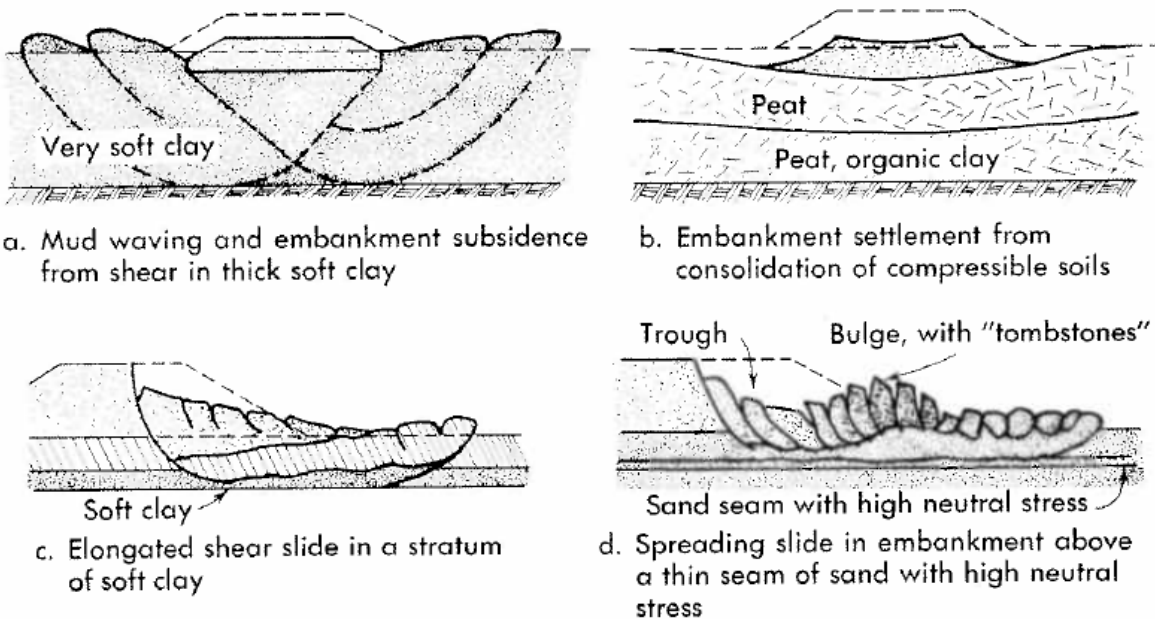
Embankment foundation problems (Sowers and Sowers, 1970)
